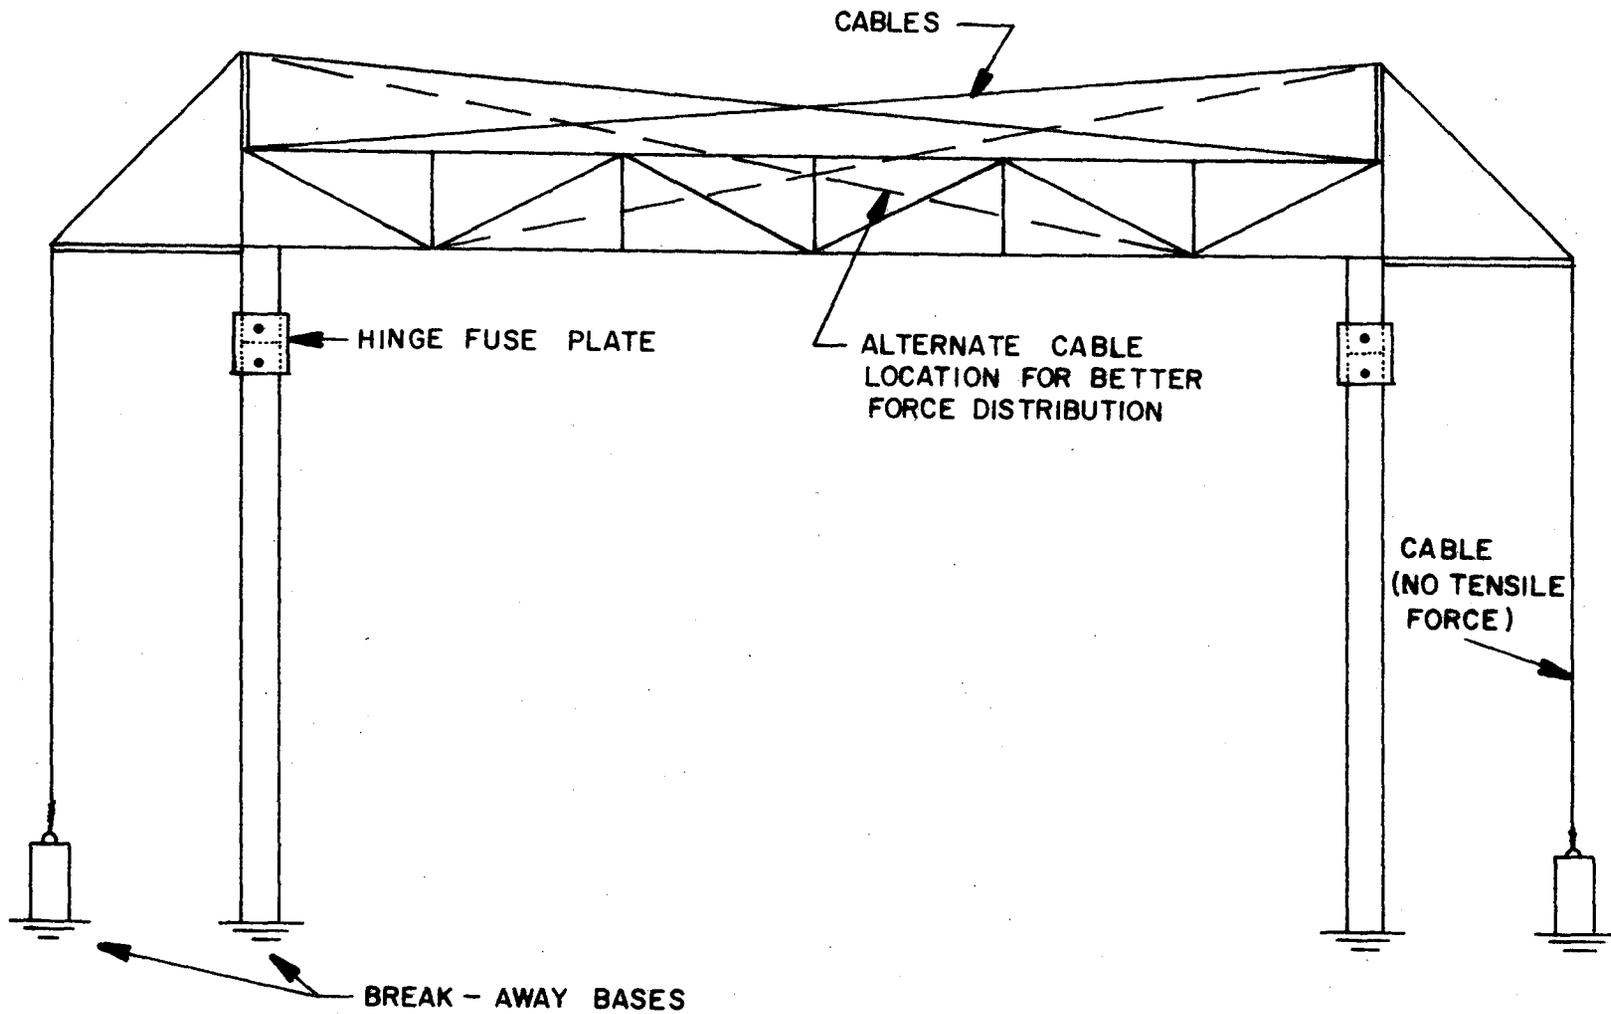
FIGURE E OVERHEAD SIGN BRIDGE WITH BREAK-AWAY SUPPORTS AND BREAK-AWAY CABLE ANCHORS (AFTER CHAPMAN)
